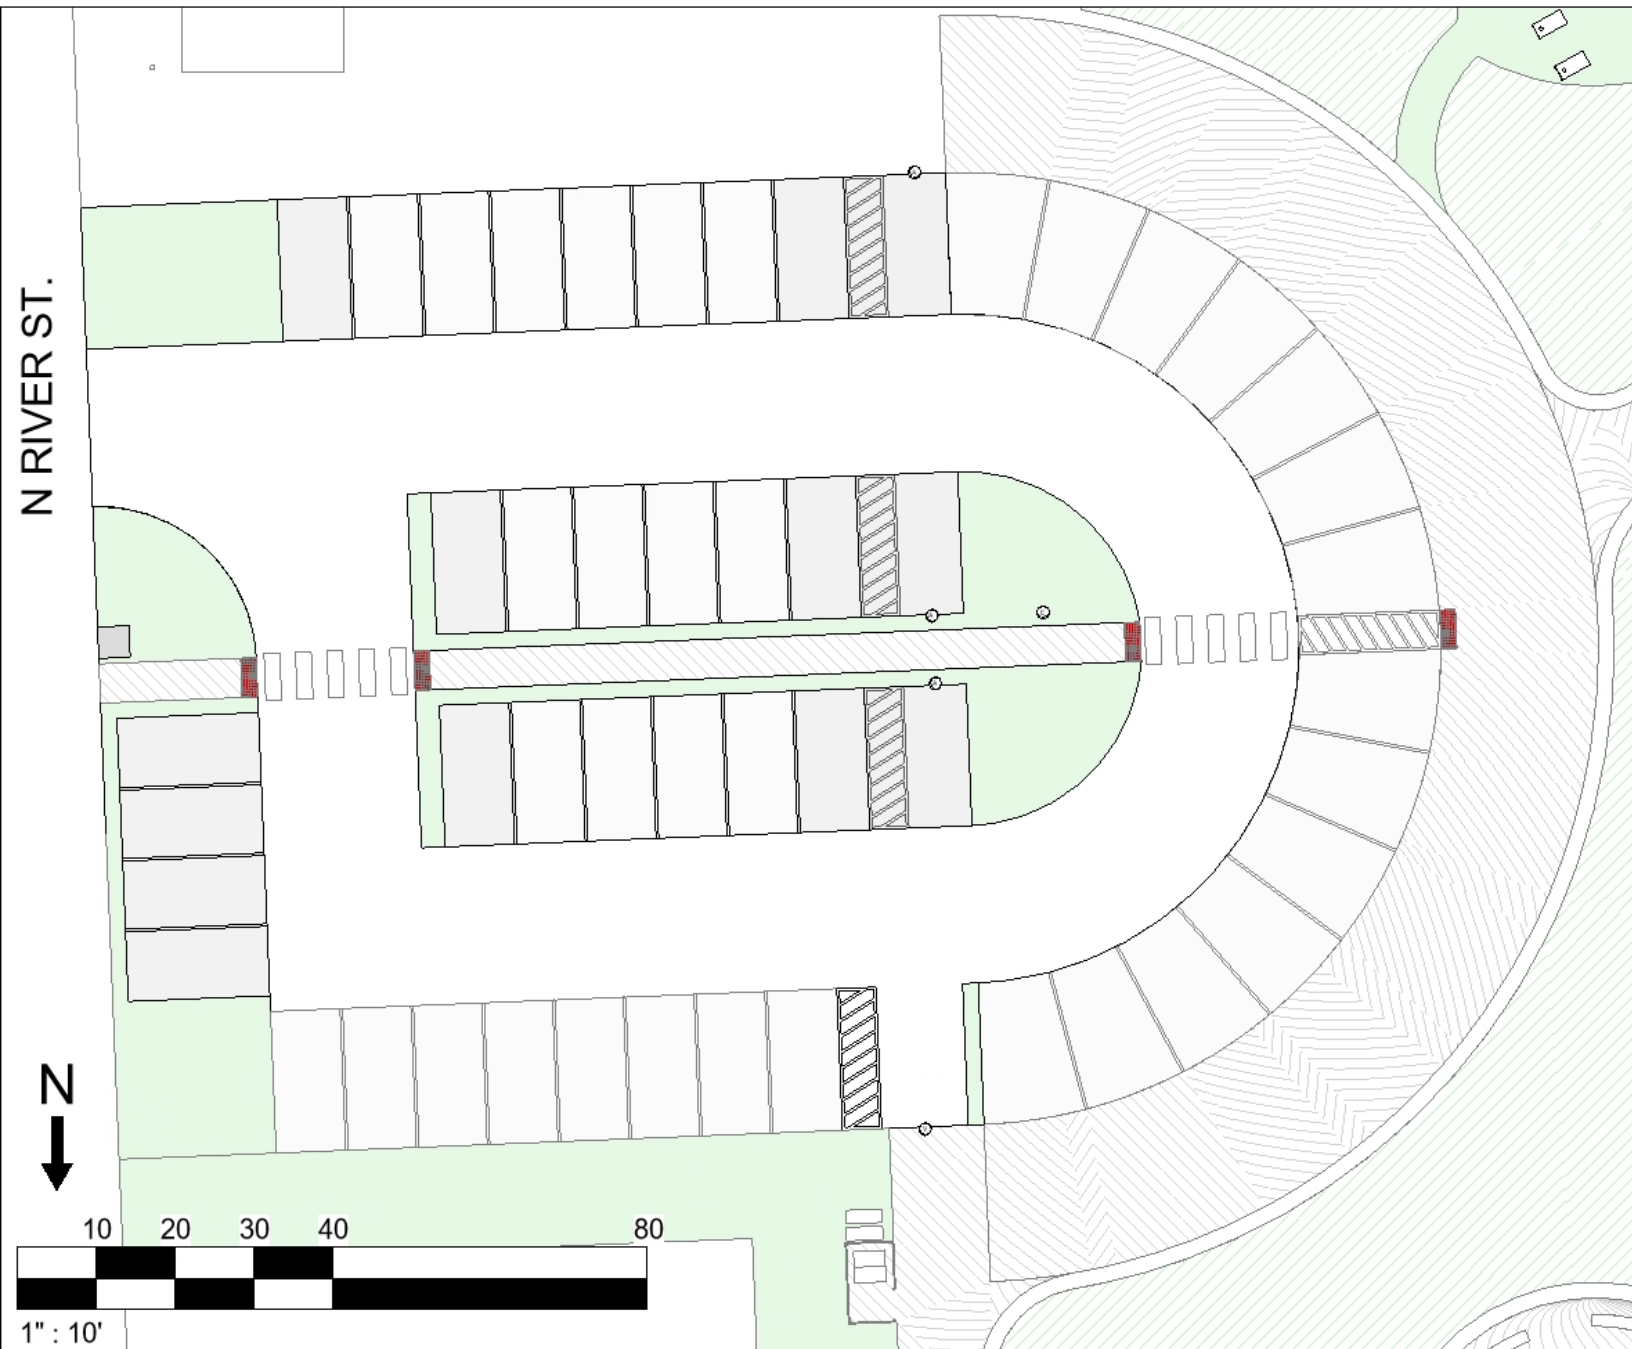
Optional expanded parking lot structure with 10 new parking spaces replacing grass. New parking spots are shown in dark gray crosshatching. Note that the three standard ADA accessible spaces were moved to the west to facilitate the expansion.
